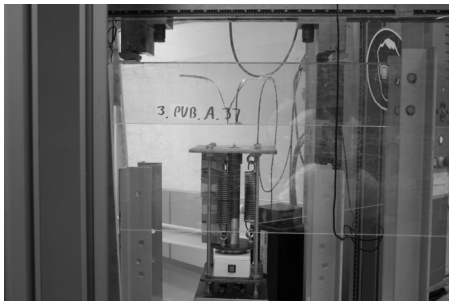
Typical model level II damage in 3.PVB.A specimen.
